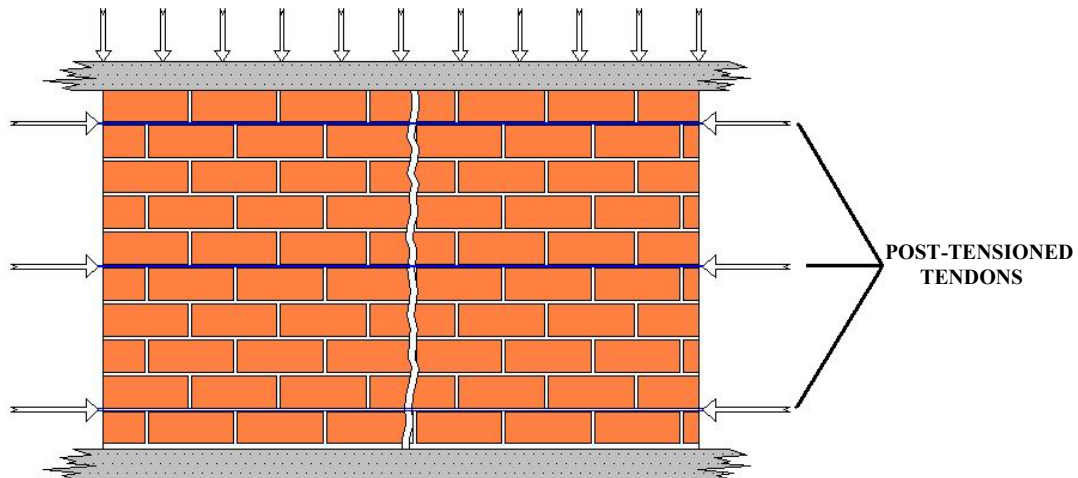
Post-tensioning of a cracked masonry wall
